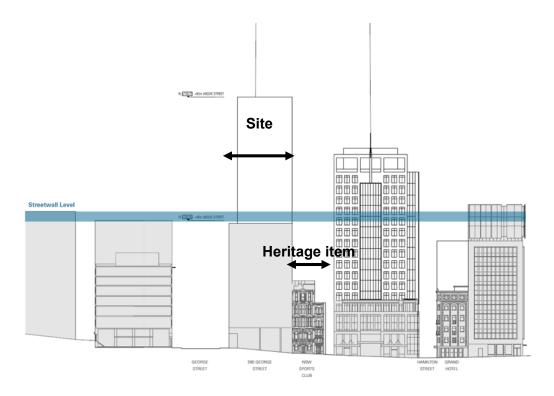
Streetscape elevation of the northern side of Hunter Street.
